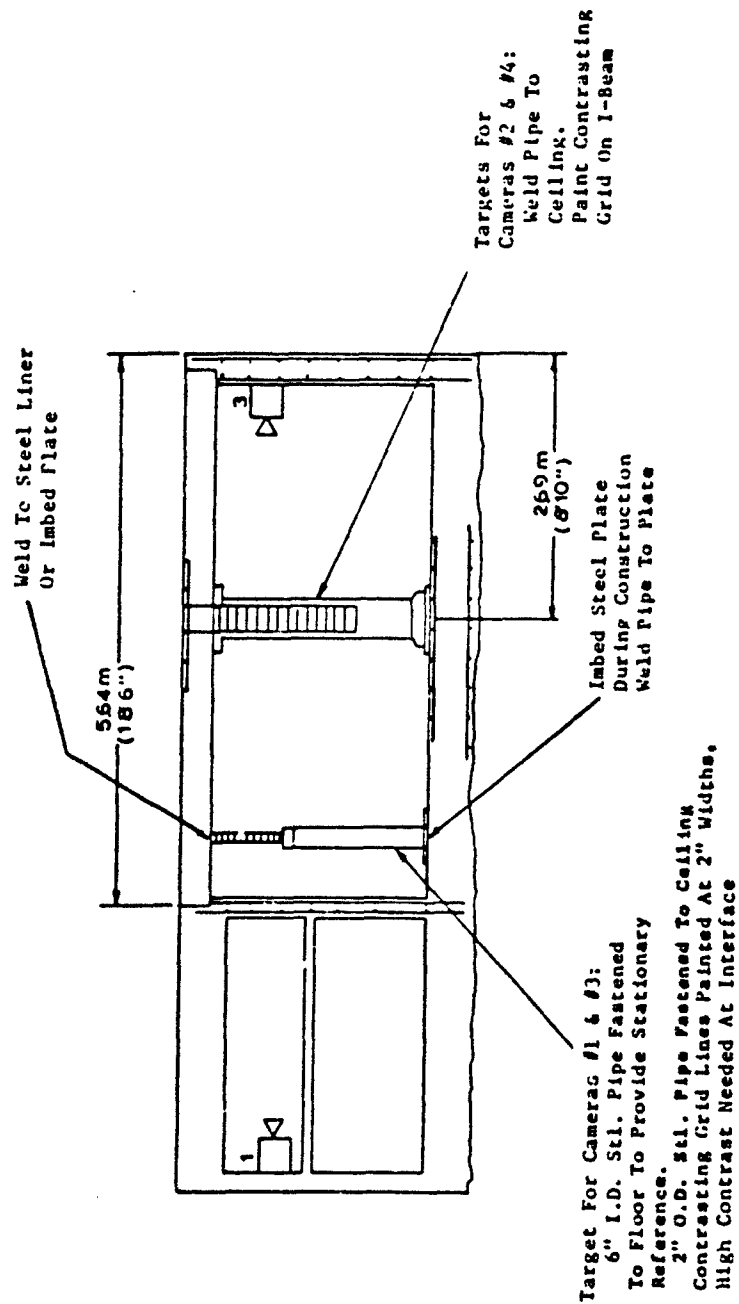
Shelter "D" Location Of Target Cameras #2 and #3, Side View
